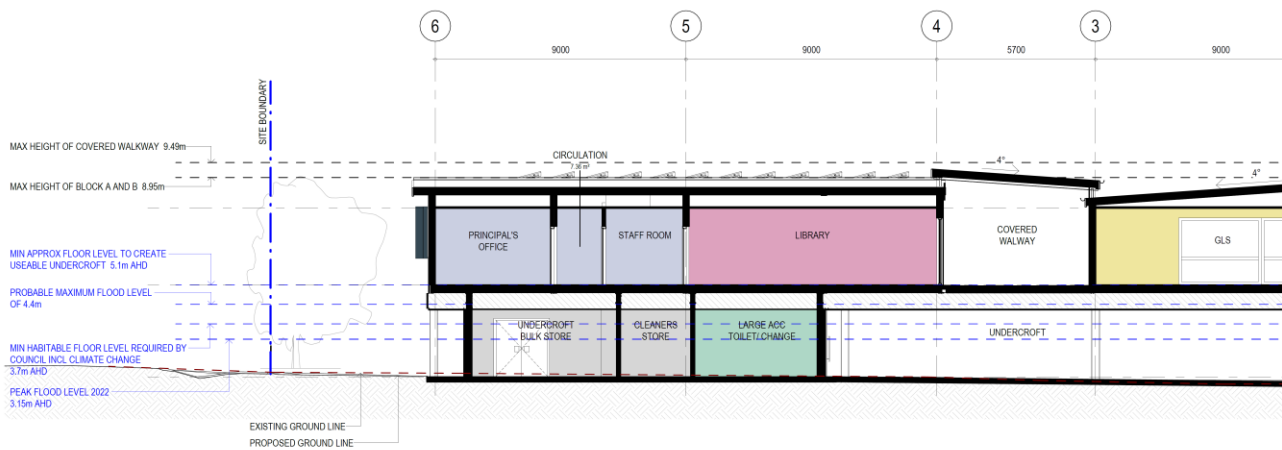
Section through elevated buildings showing flood levels and proposed elevated flood level (Source: Pedavoli Architects)
